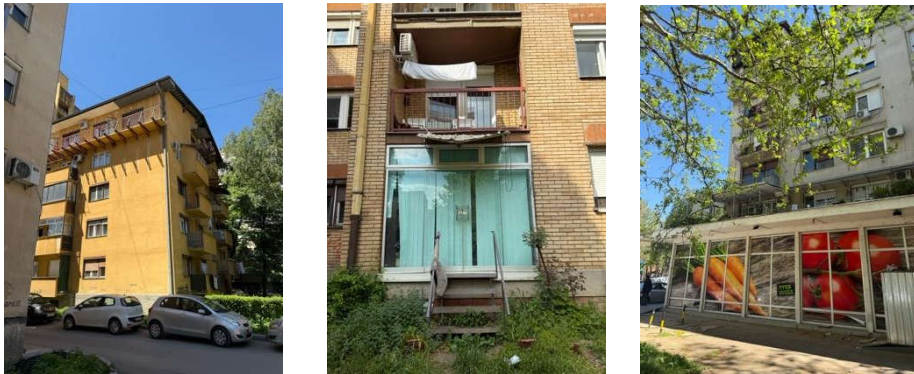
Examples of creating private open spaces in apartment buildings in Niš, source: B. Stoiljković
